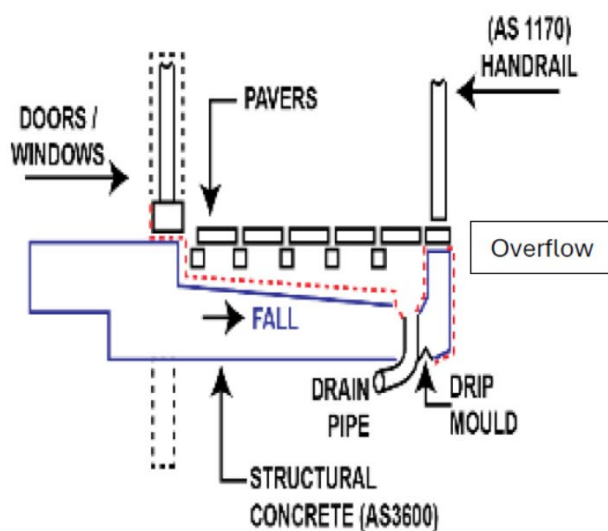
Typical concrete balcony construction details (pods and pavers installation). The waterproofing membrane is per AS 4654.1, and indicated by a dotted red line (---).
